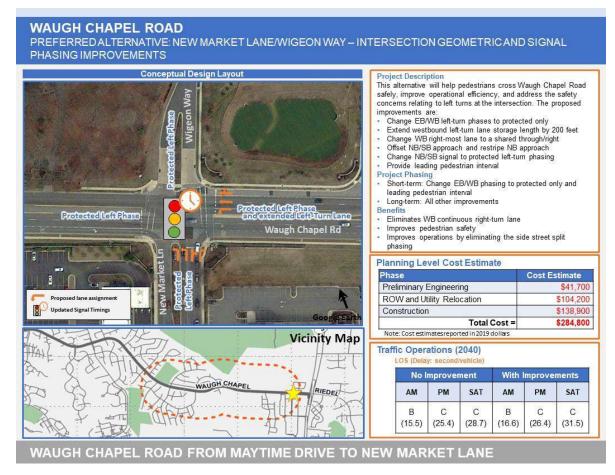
Project Summery for the Preferred Alternative at New Market Lane/Wigeon Way/Waugh Chapel Road Intersection
